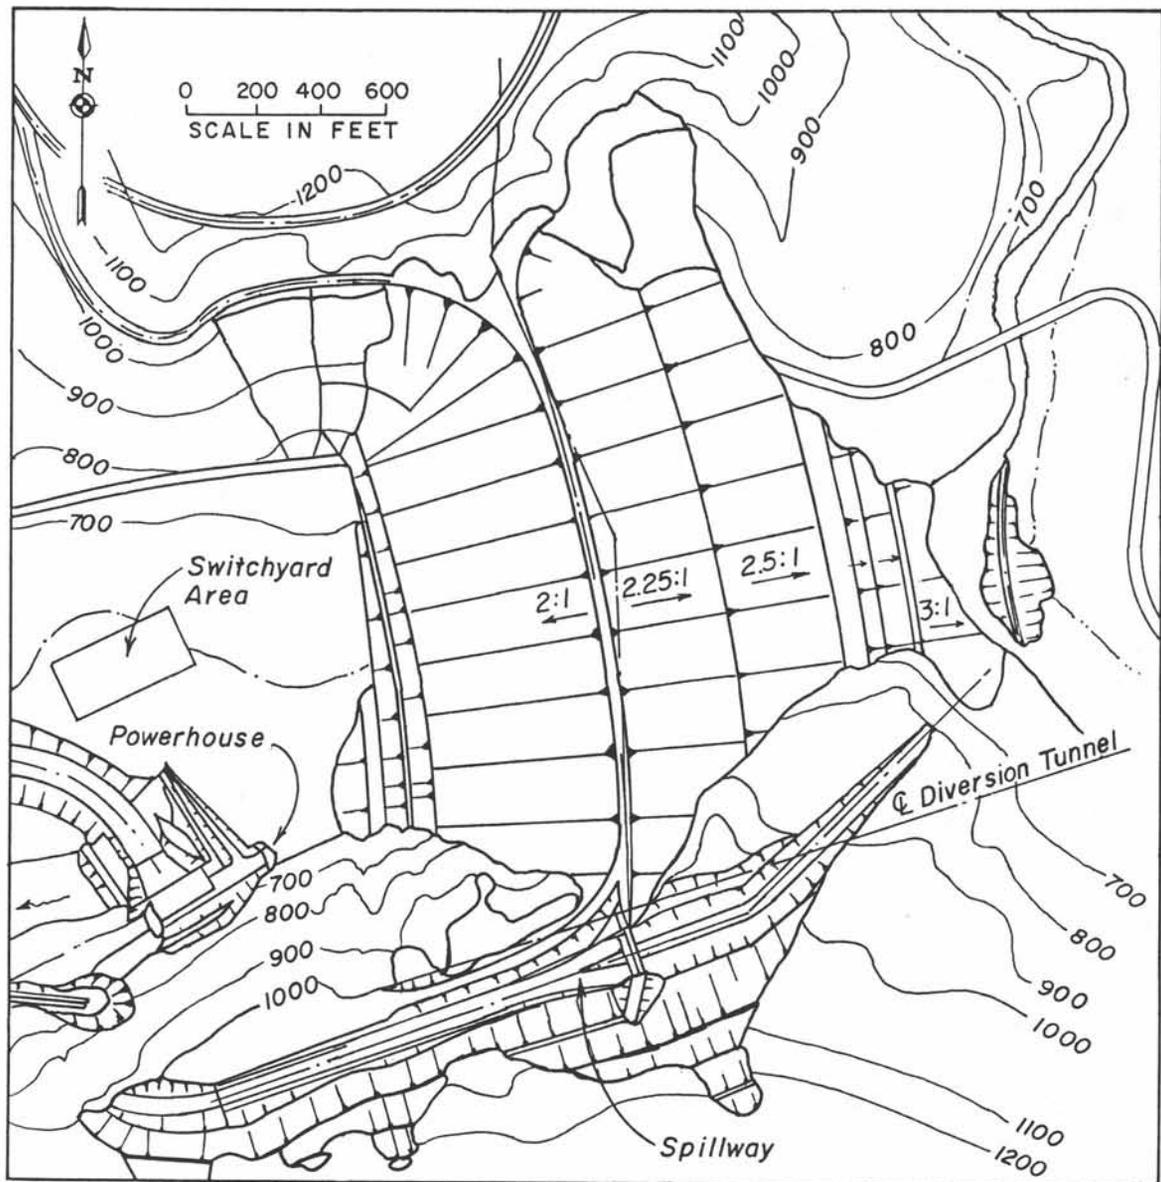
General plan of structures at Swift Dam. From Pacific Power & Light (1987).
